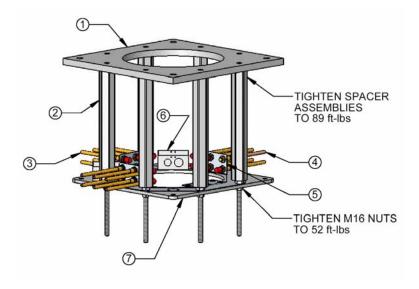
110107 Mounting System Components (see drawing 110107 for complete rough-in)
